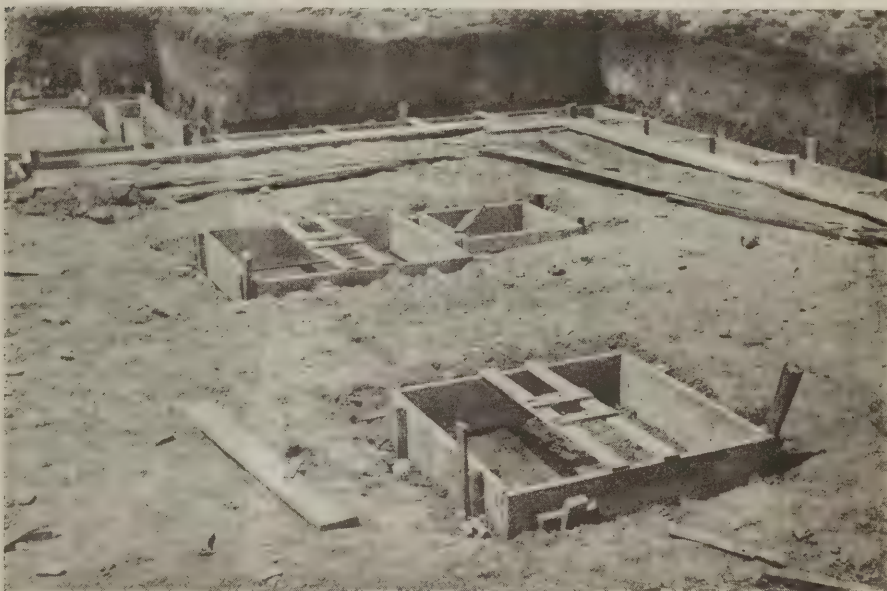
The footings and piers are always constructed entirely separate from the basement floors, since the latter are but thin slabs not intended to bear structural weight.
